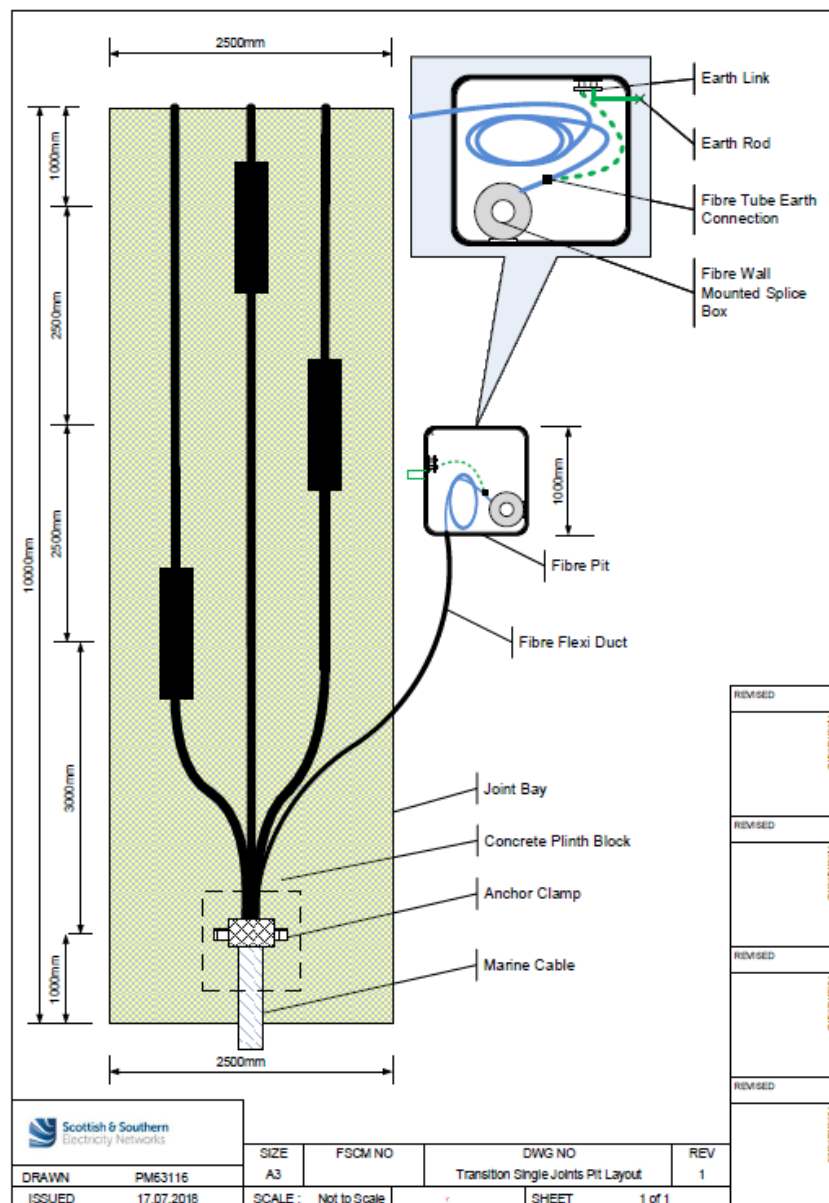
Example of a TJP final layout (SSEN 2019)
